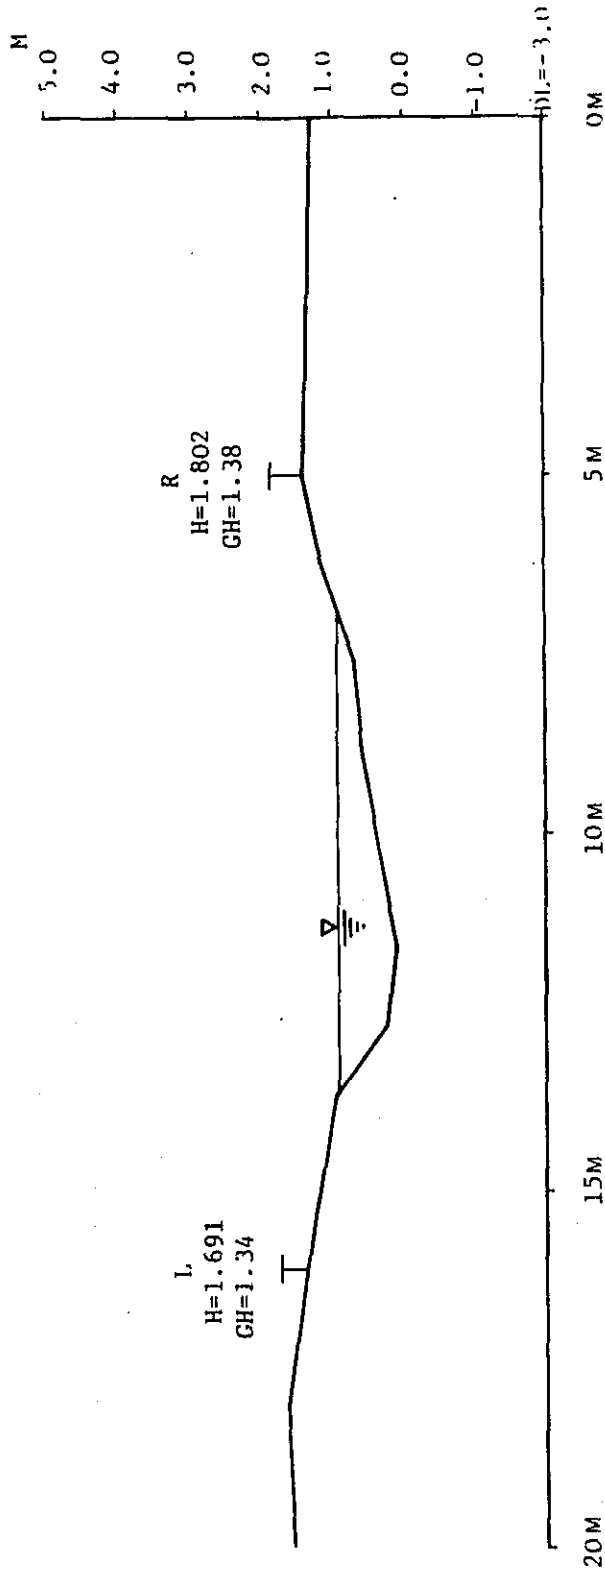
(1) CROSS-SECTION OF EXISTING CHANNEL
